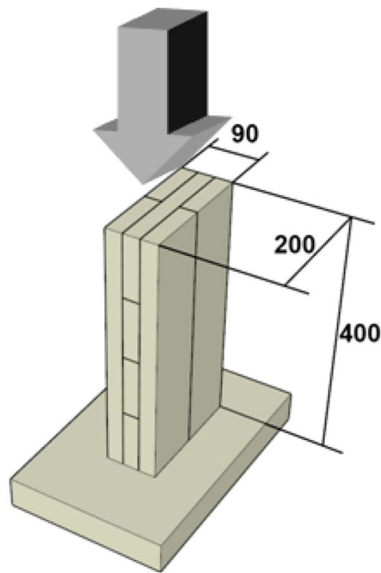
Compression test specimen for CLT (cross-laminated timber) panel (unit: mm)
